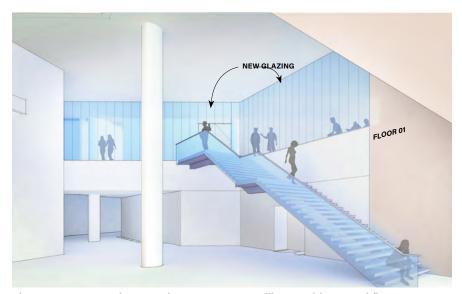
Proposed new staircase to connect library with ground floor at Bonnell Building
